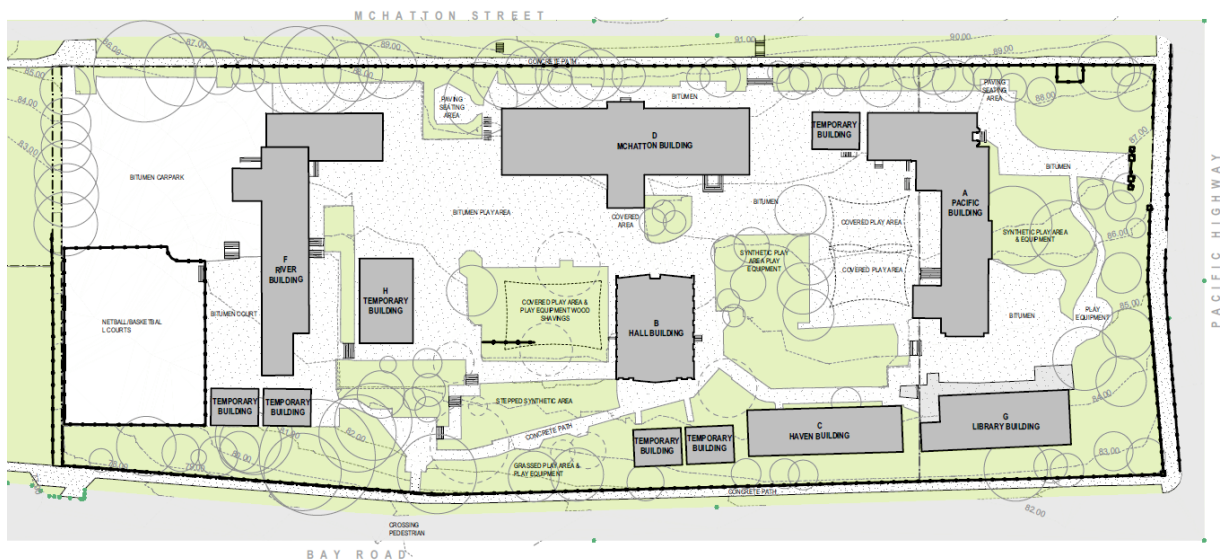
NSPS Site Plan (Source: Fulton Trotter Architects)
